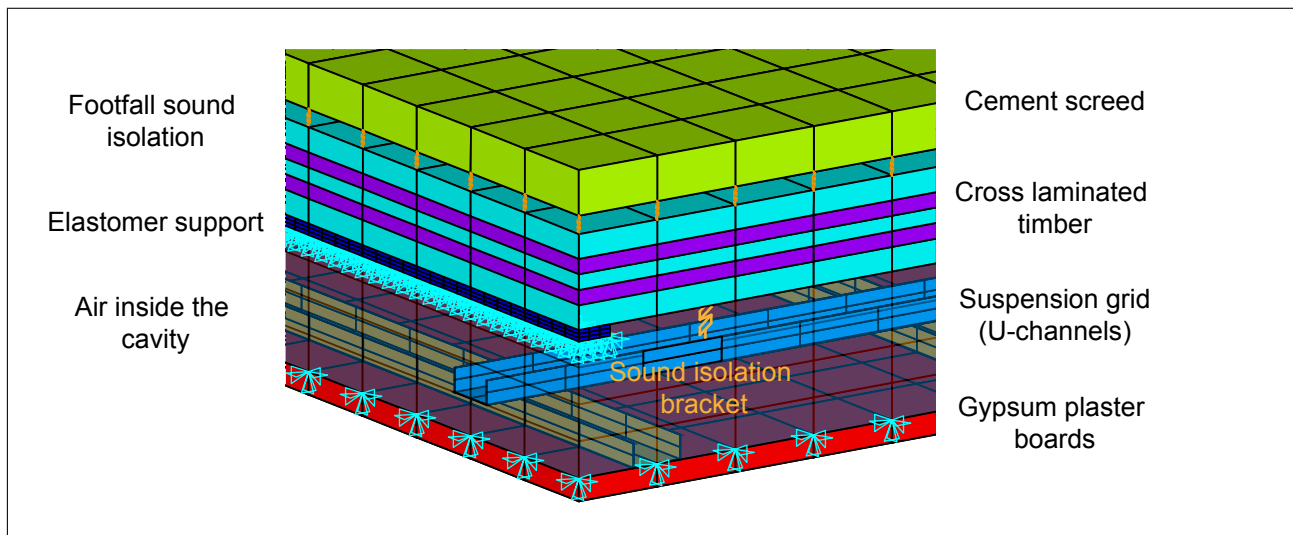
FE model of a cross laminated timber slab with suspended ceiling and floating floor
